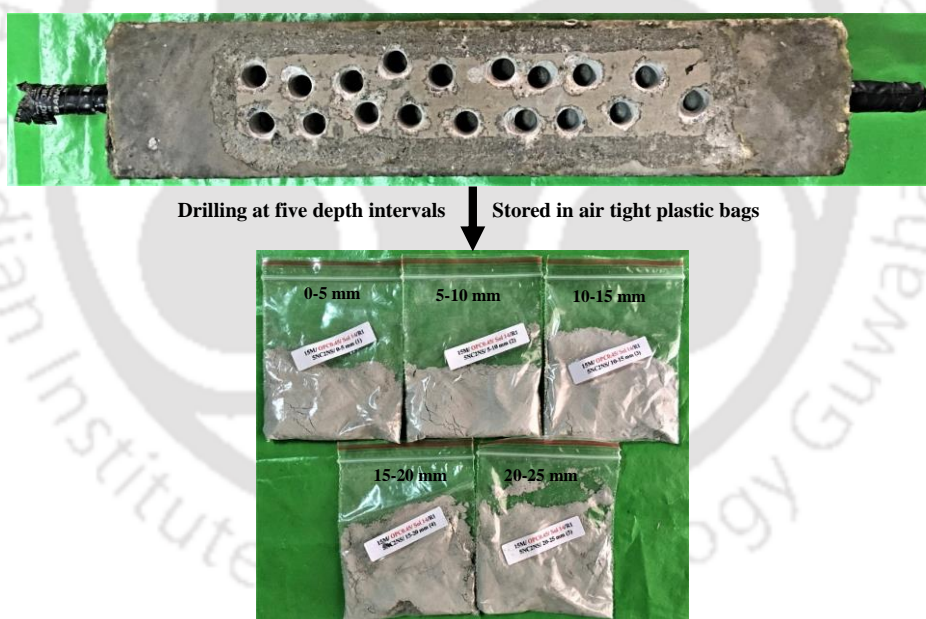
Photographs of prismatic reinforced concrete specimen after drilling and collected concrete powder samples
